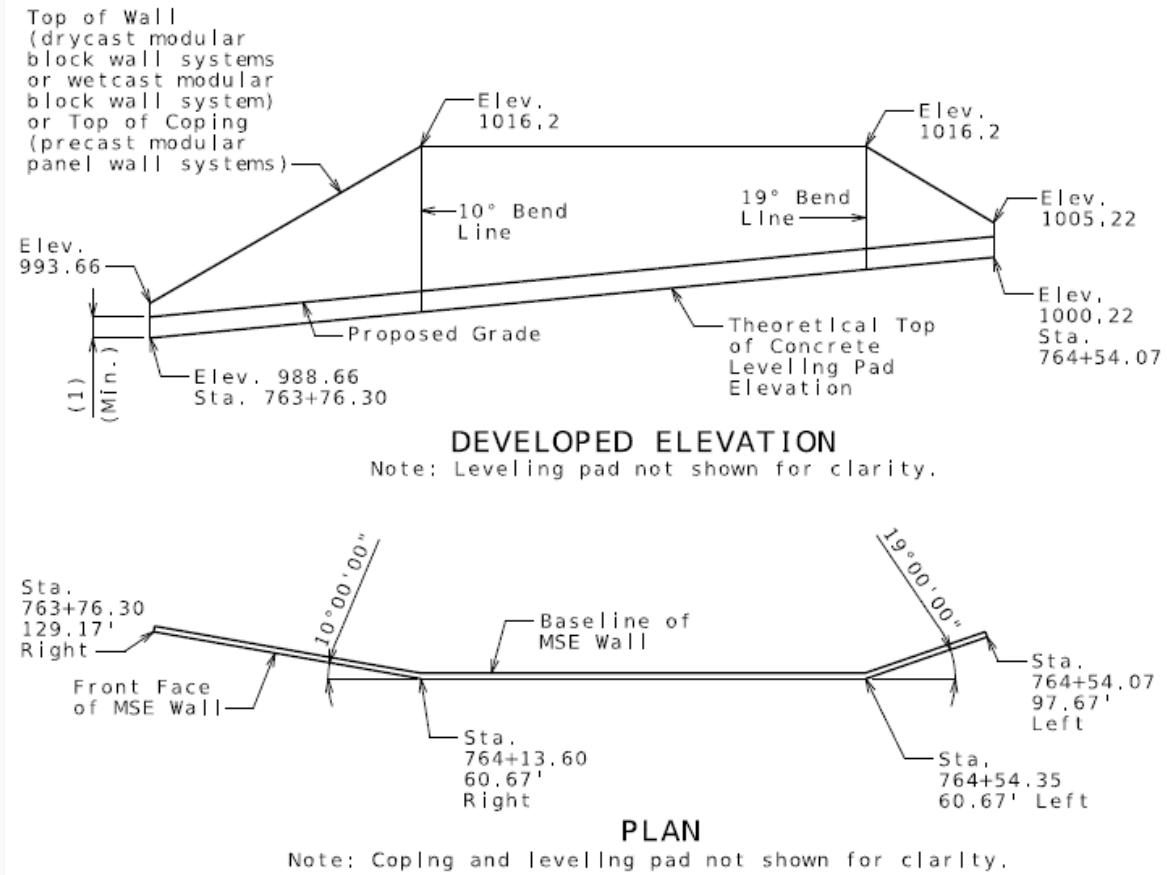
MSE Wall Developed Elevation and Plan
